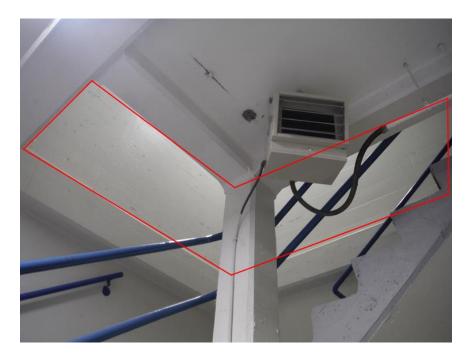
Large Diaphragm Opening Adjacent to Shear Walls
